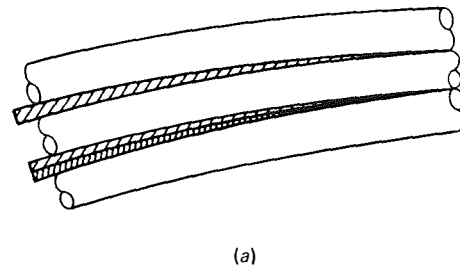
Severin Bridge, cable arrangement. (Courtesy of Acier-Stahl-Steel, from reference 16.)
